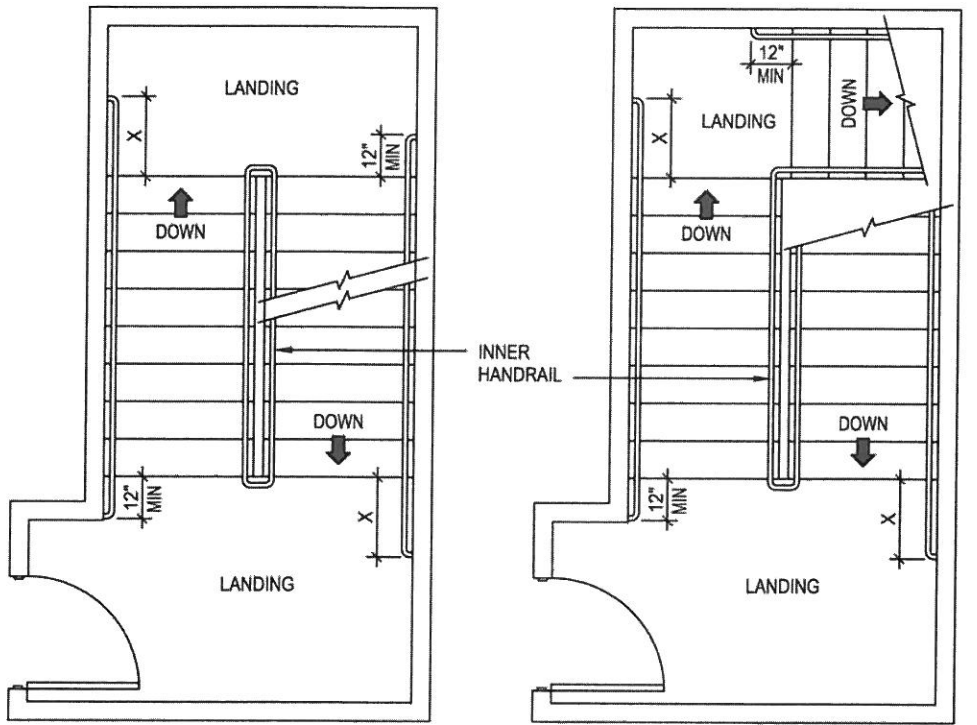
B-35—WARNING STRIPING AND HANDRAIL EXTENSIONS
